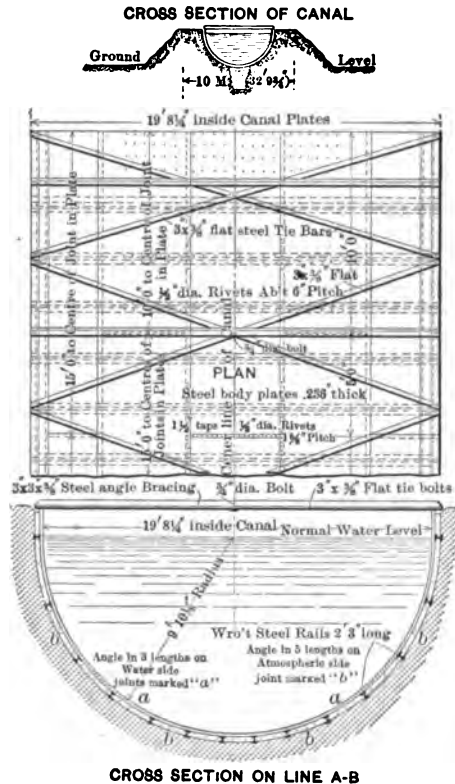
Plan and Section, Sheet Steel Flume, Upper Egypt.
